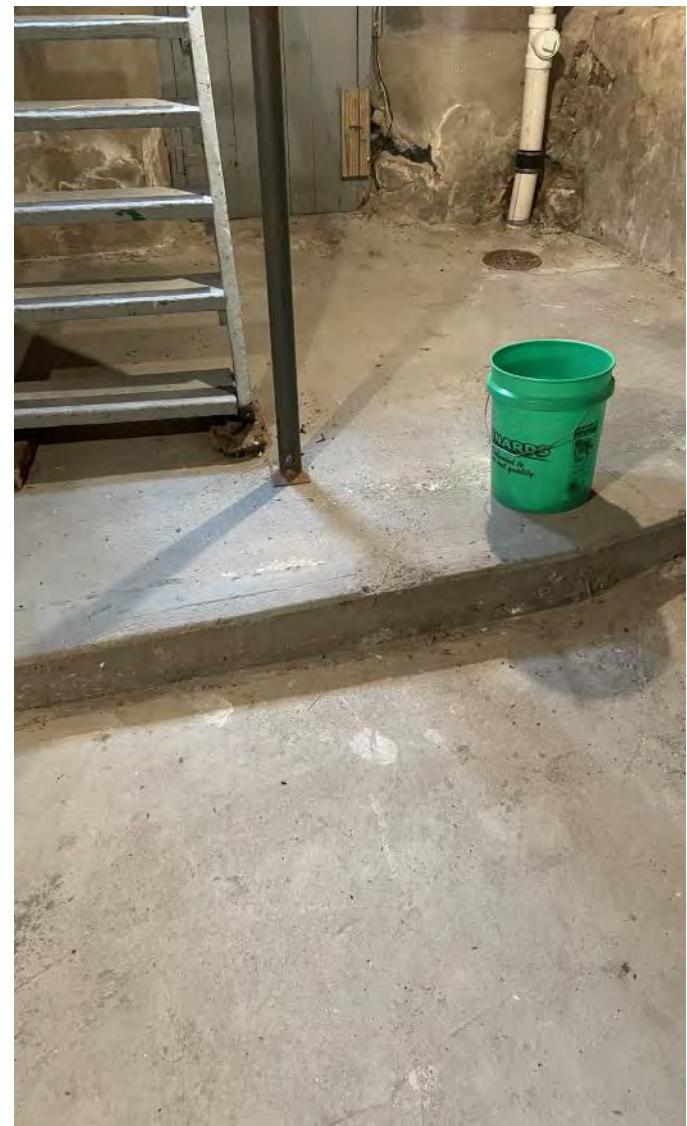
Elevated portion of the basement floor located on the south side of the basement. Photograph taken on May 19, 2023.
